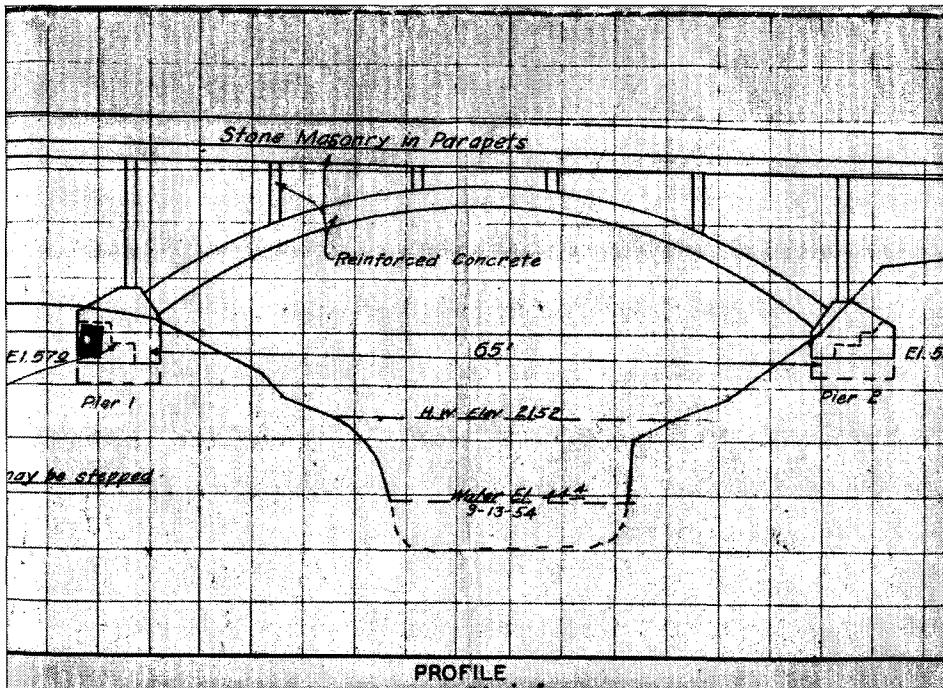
Historic photo showing plan for Ohanapecosh River Ridge indicating arched bridge with stone masonry to match the other rustic bridges, 1952 (MORA Archive).
